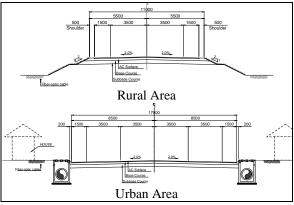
Typical Cross Section of Sri Sophorn–Poipet Section
